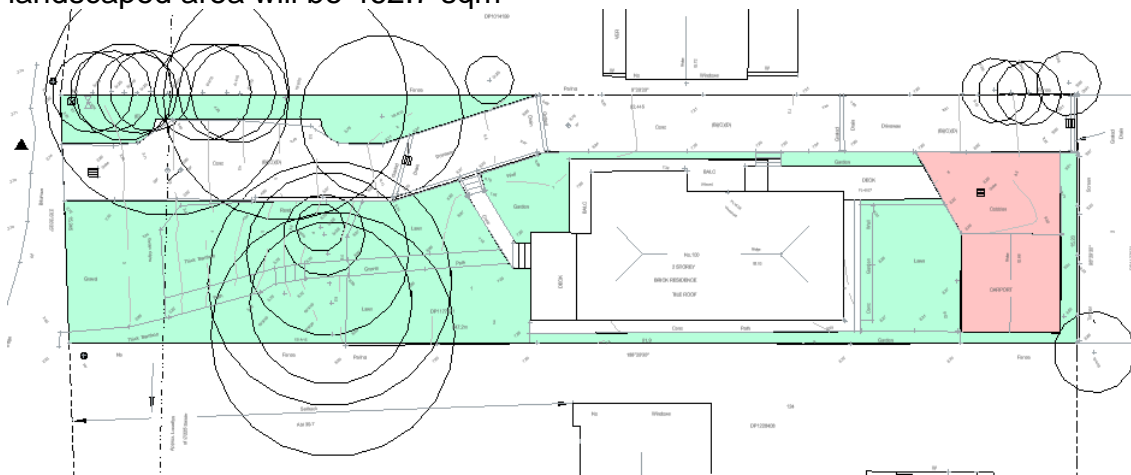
The green areas represent the existing landscaped spaces that will be retained, while the pink areas highlight the concrete surfaces that will be removed and replaced with new landscaped areas
